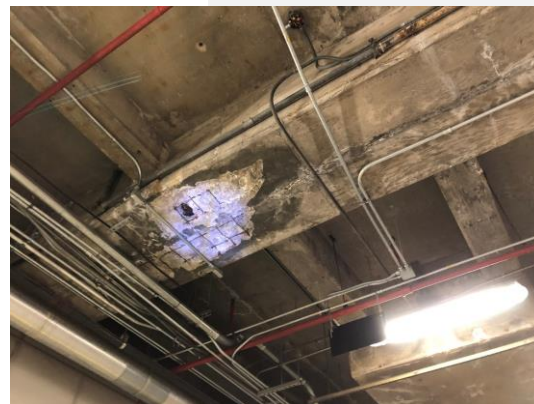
Exposed and Corroded Rebar at Loading Dock Concrete
